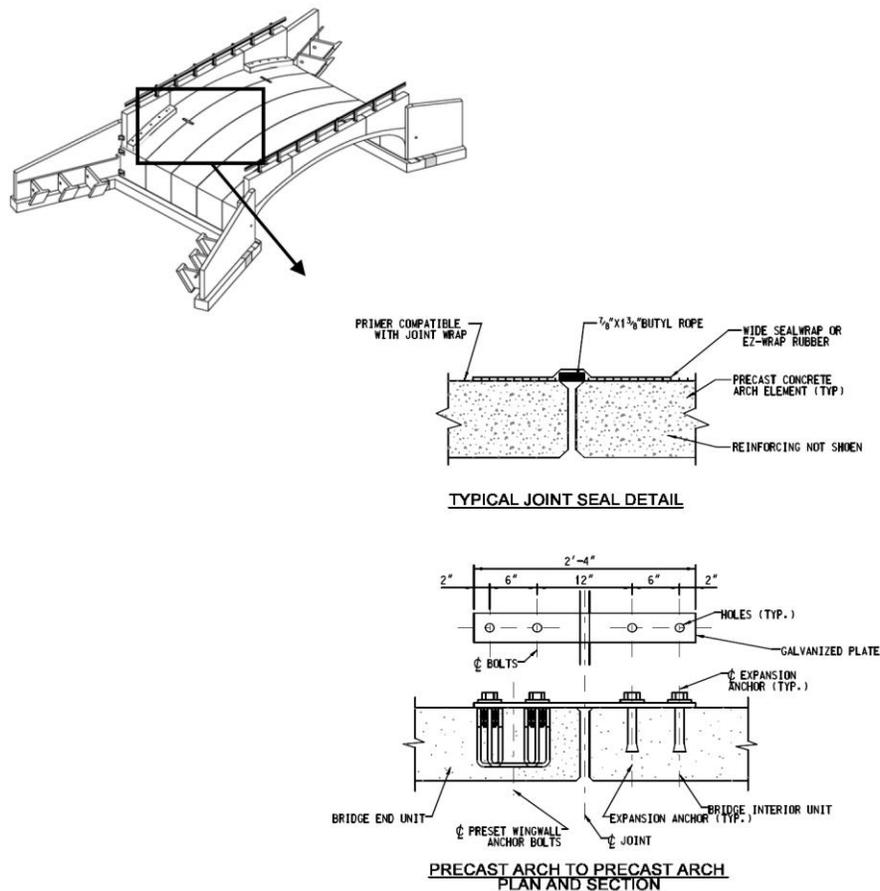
Connection of Adjacent Precast Arch Units [8].
